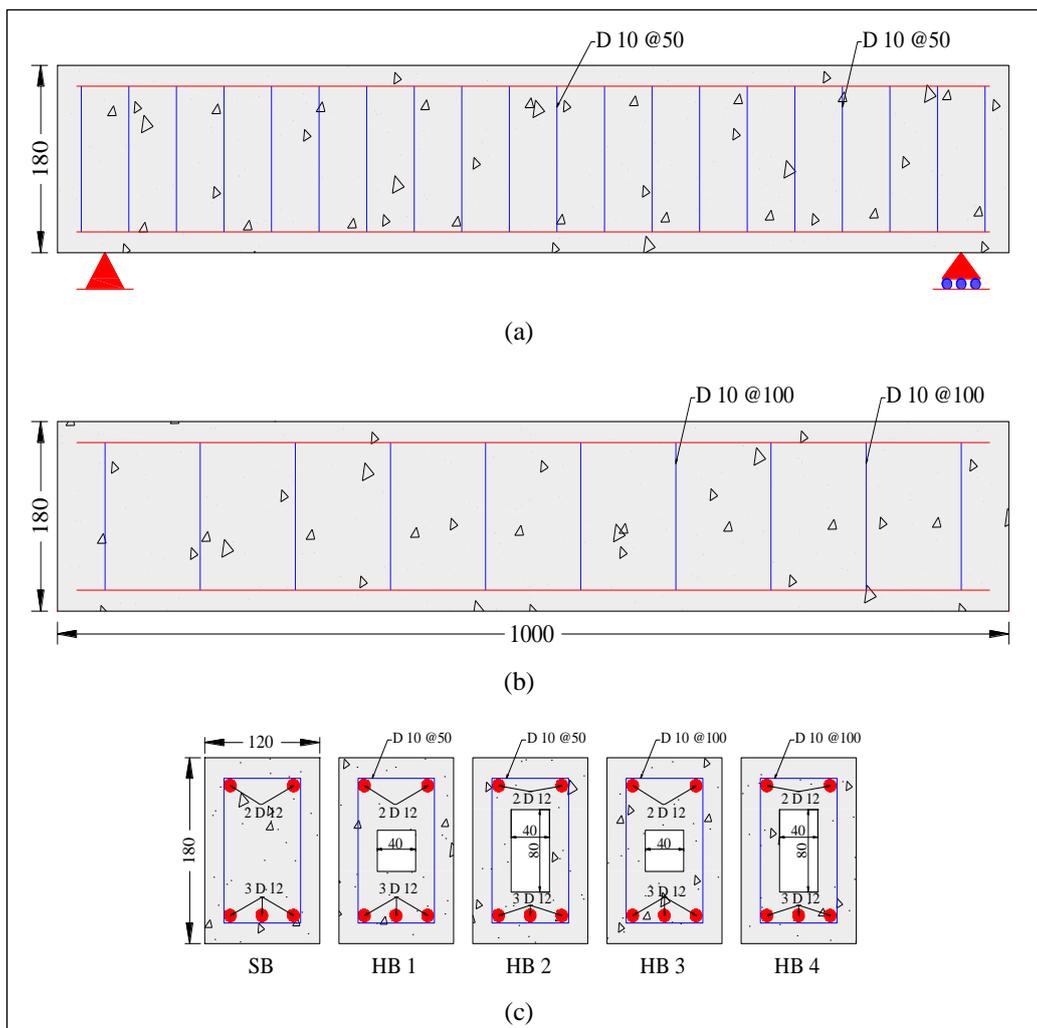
Details of specimen, longitudinal and shear reinforcement: (a) Shear reinforcement Ø10mm at 100 mm, (b) Shear reinforcement Ø10 mm at 50mm, (c) cross section. All units in mm [2].
